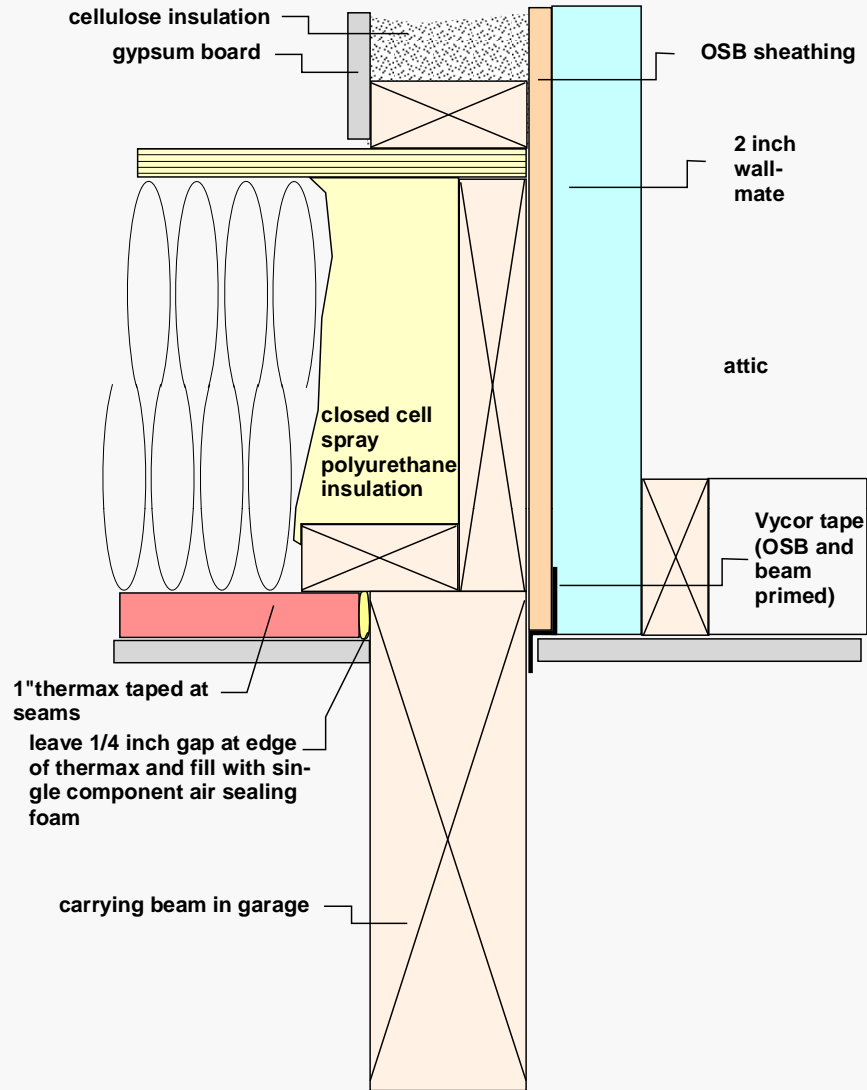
Section through bonus room floor, carrying beam and attic space above garage.
